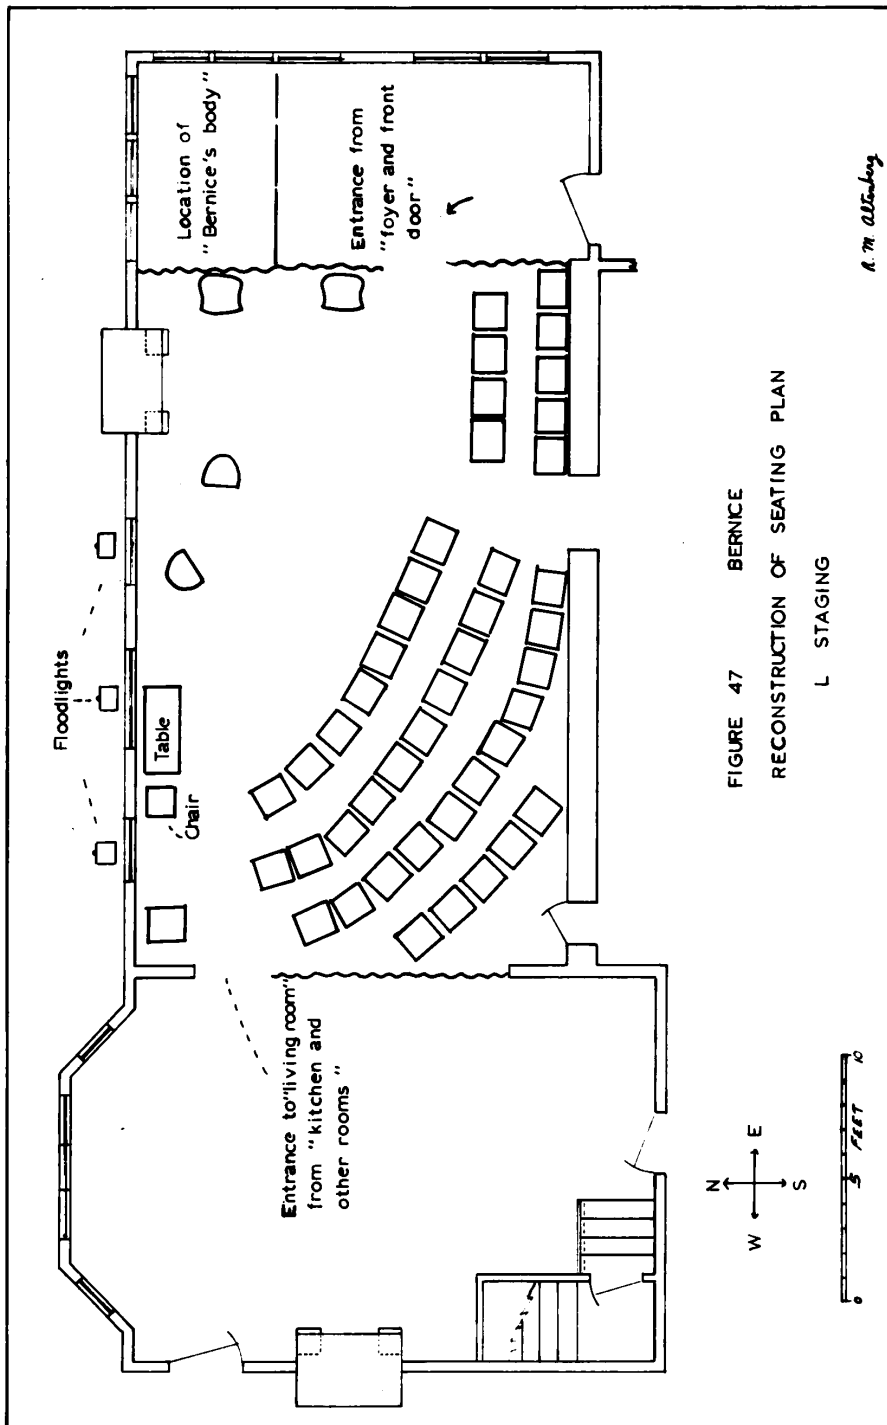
Reconstruction of L staging floor plan, *Bernice*.
